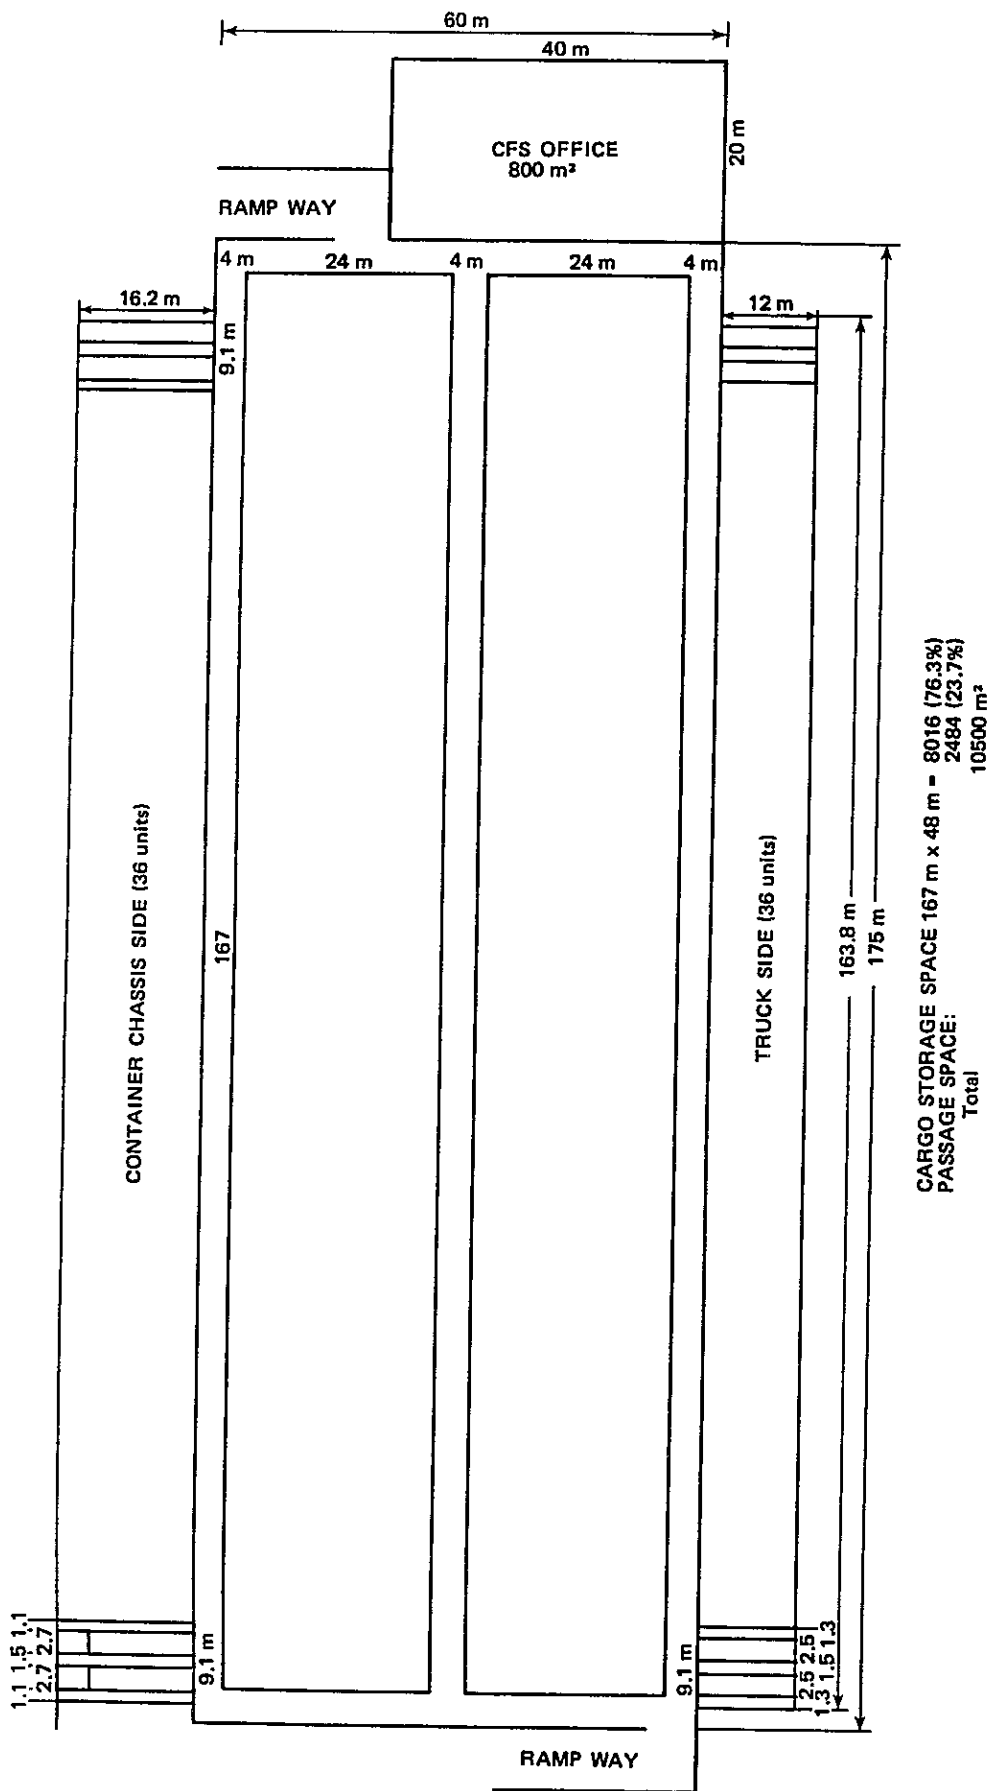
CONTAINER FREIGHT STATION ARRANGEMENT (Short Term Plan)
